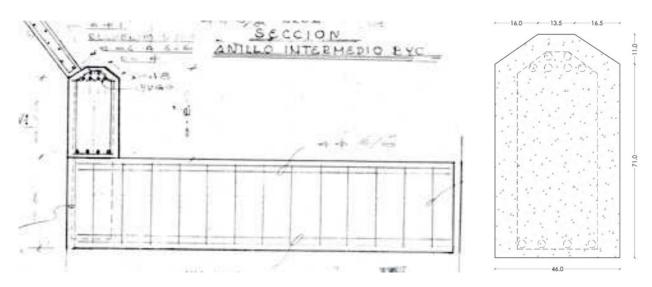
The structural organization of the circular lower beam as indicated in the original design (left - ISA archive); drawing of the beam resulting from the on-site surveys (right).
